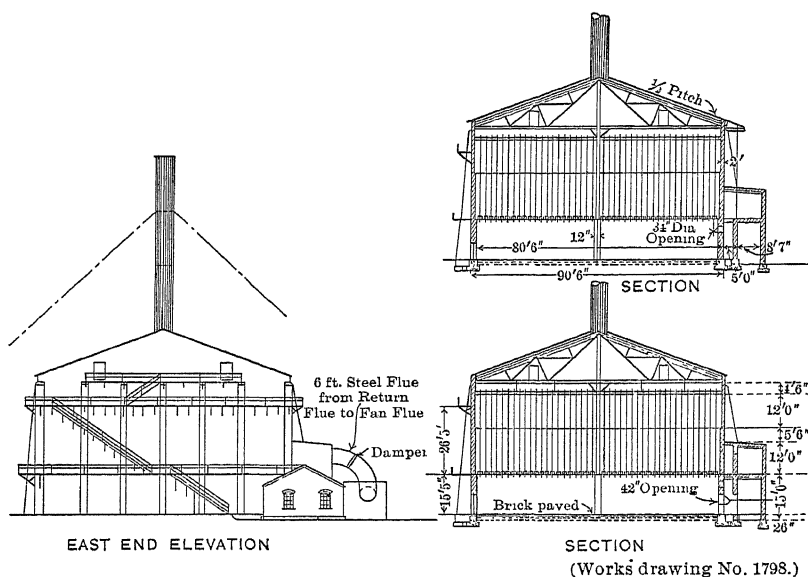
REVISED LATERAL SECTIONS AND ELEVATIONS OF BAG-HOUSE.
